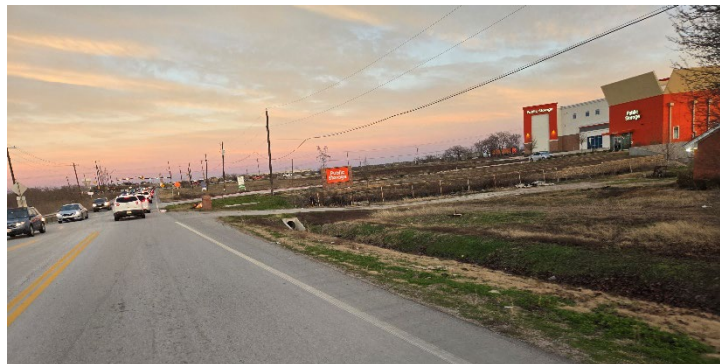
Site Photos taken by staff on 1/30/2025; view from 644 E Bonds Ranch Road of the Public Storage and vacant land in the surrounding parcels.
